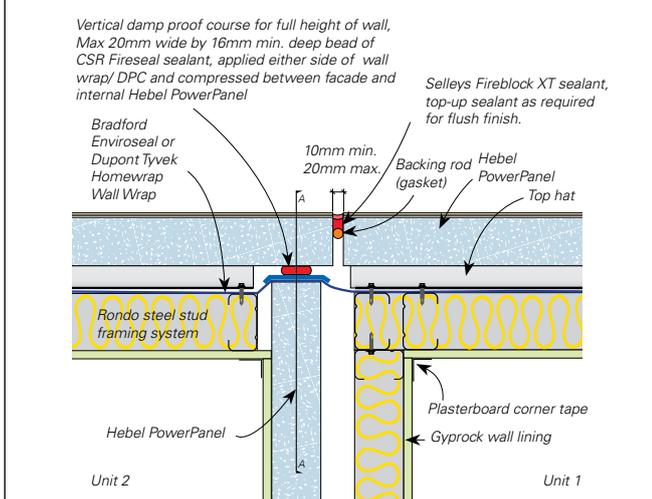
Hebel Intertency / Corridor Wall to Hebel Facade Wall junction - SECTION AA
